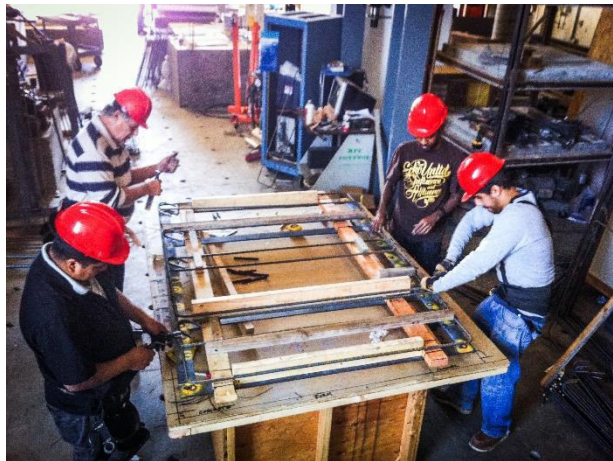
Stirrup assembly at the UCI structural lab using a prefabricated mold
